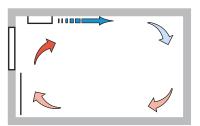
A front wall, ceiling mounted, built-in diffuser.
